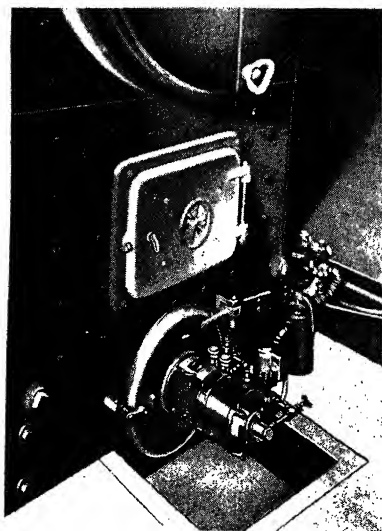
Typical installation of horizontal-rotary burner on steel heating boiler. (Courtesy of Ace Engineering Company.)
